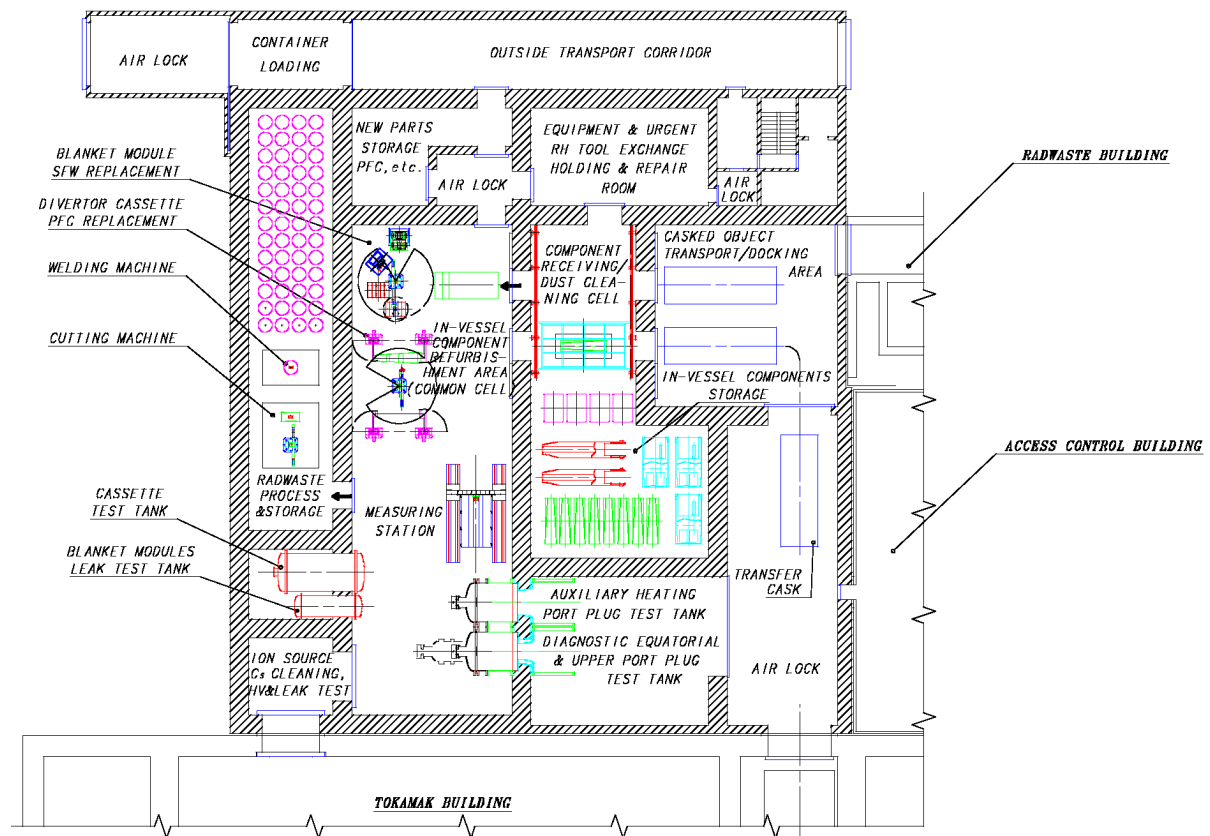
Overview of the Hot Cell (Ground Floor Layout)
